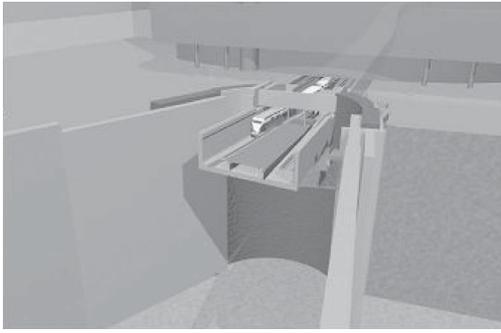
Cross-section of the old station, diaphragm walls and frozen soil for the new station.
